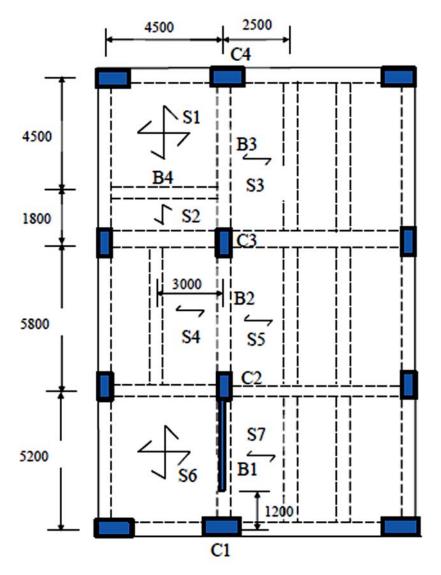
Framing plan indicating Beam B1-B2-B3.
